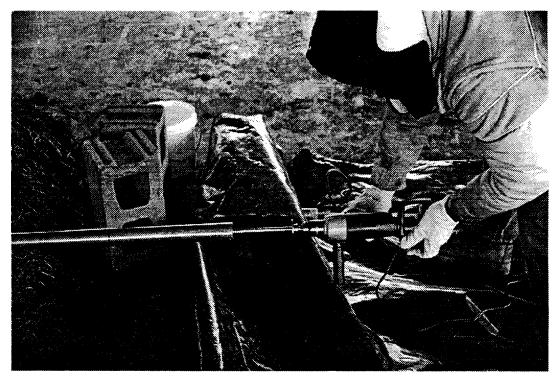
Coring Performed with Drill Motor Attached to Coring Tool
